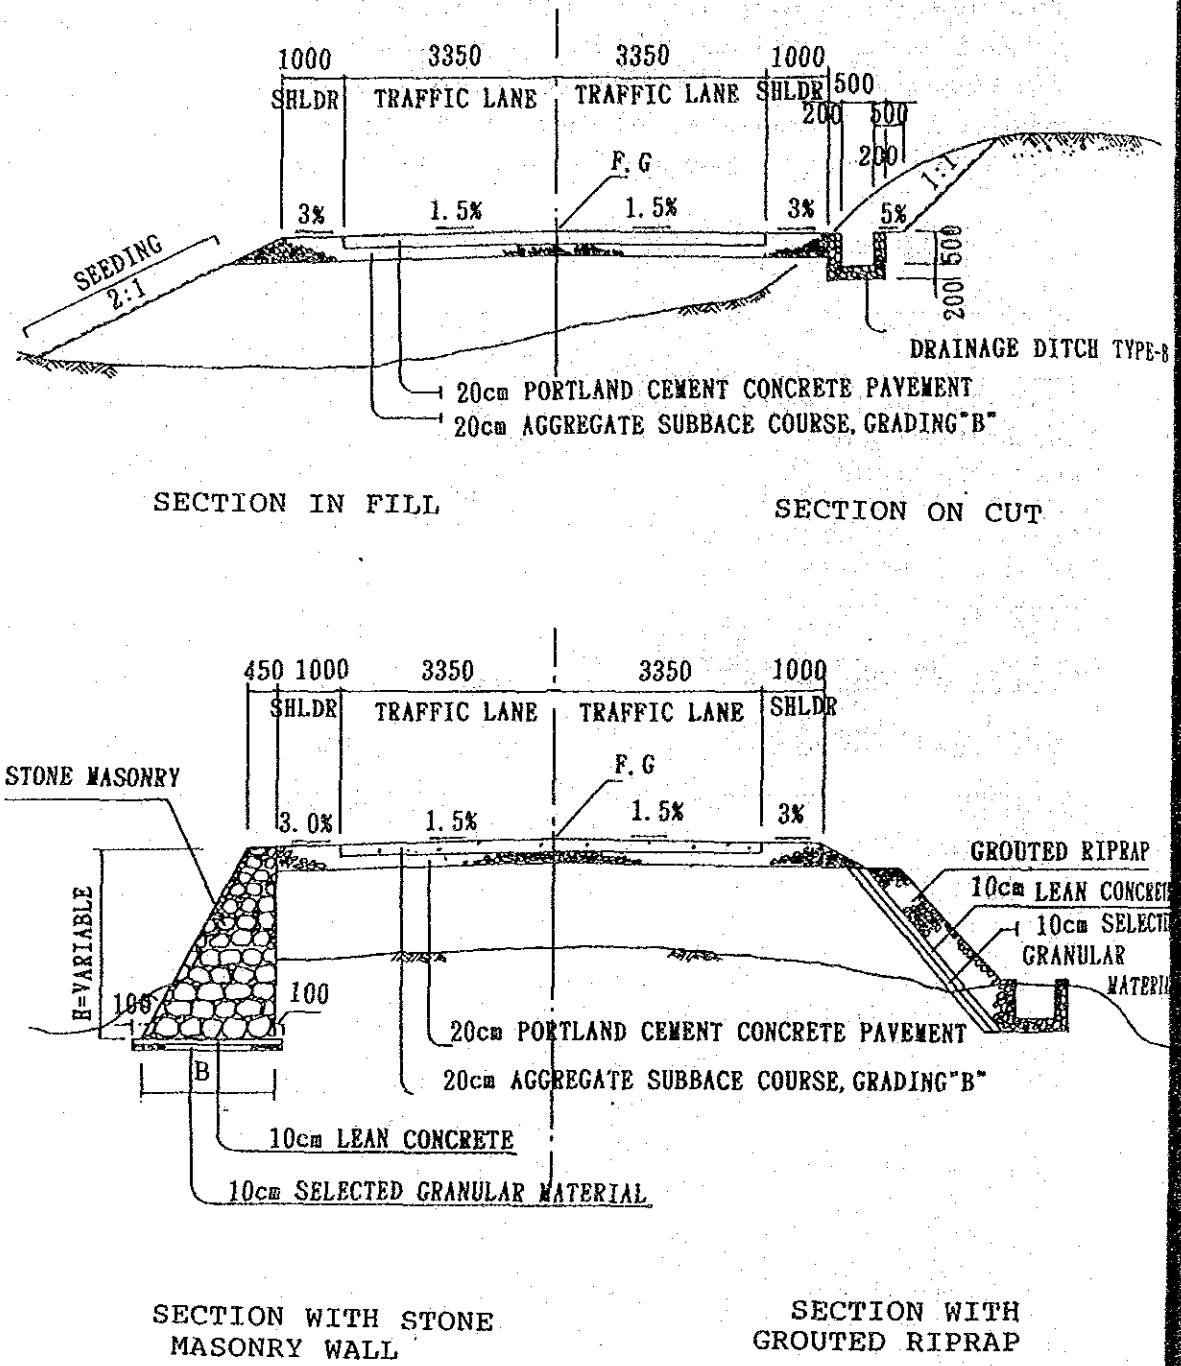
TYPICAL ROADWAY SECTION
